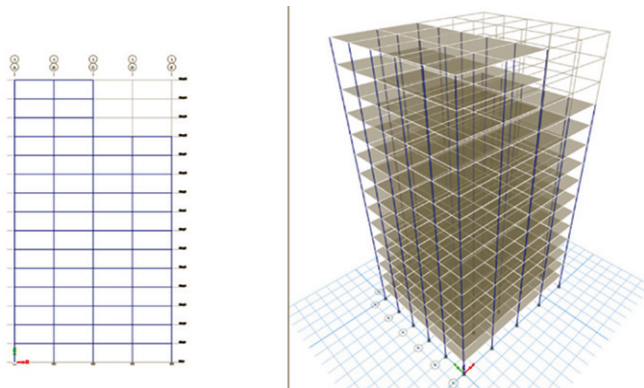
Views of the Vertical Geometric Irregular-1 Model in elevation and 3D for both composite and RC buildings
